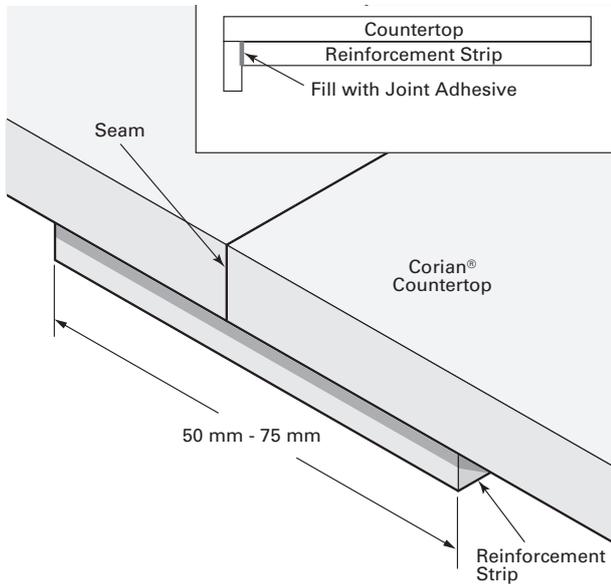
Reinforcement strip runs from edge buildup strip to back of top
